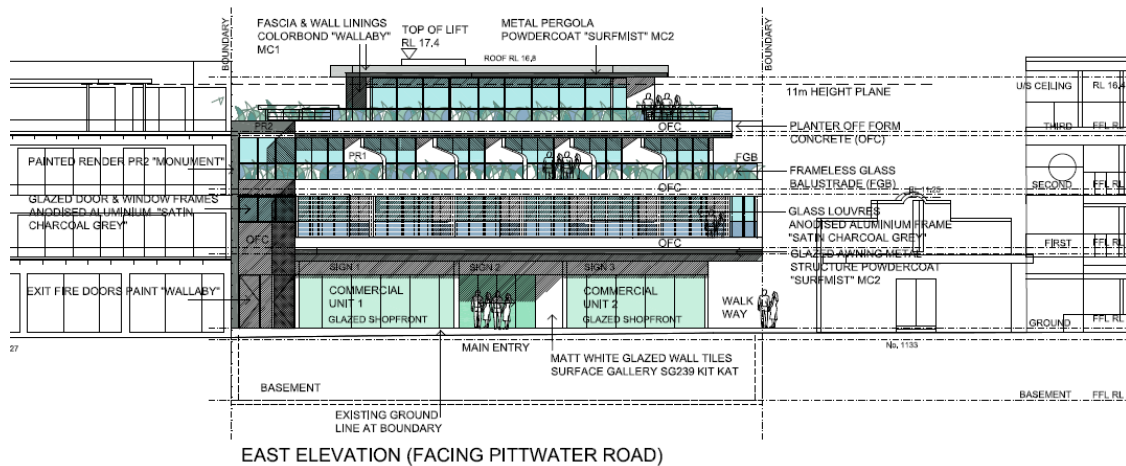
Plan (east elevation) extract showing extent of 11 metre building height breach
